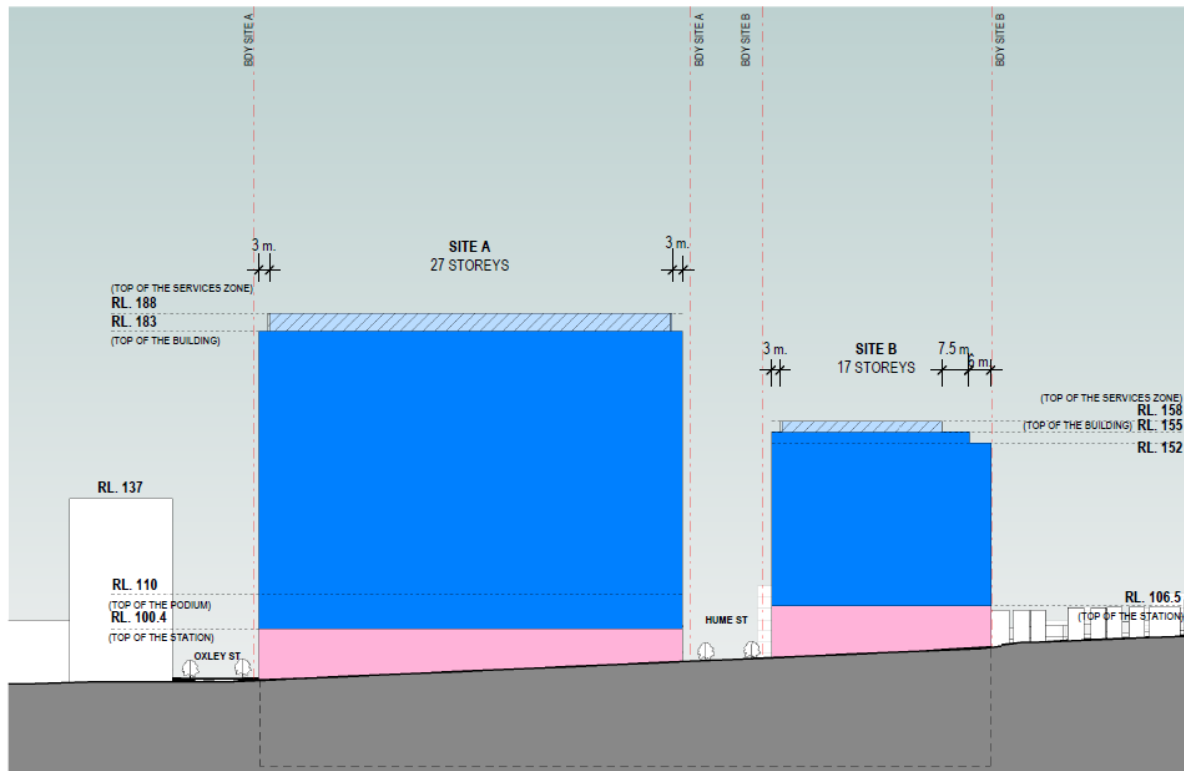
Proposed Crows Nest OSD building envelopes- west elevation (Pacific Highway)
